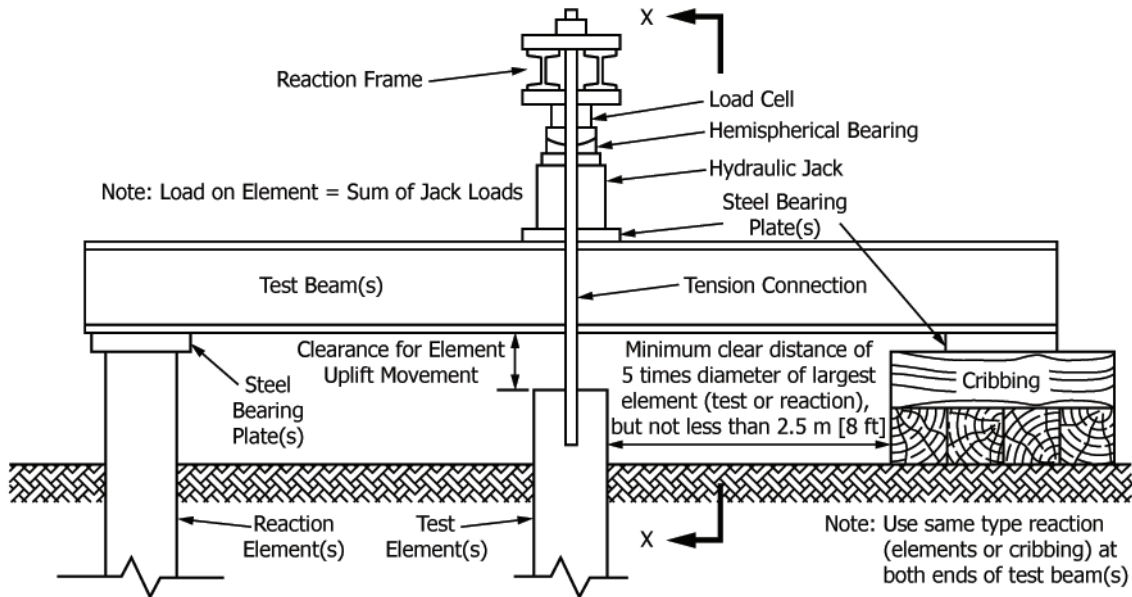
Typical Setup for Tensile-Load Test Using Hydraulic Jack(s) Supported on Test Beams
